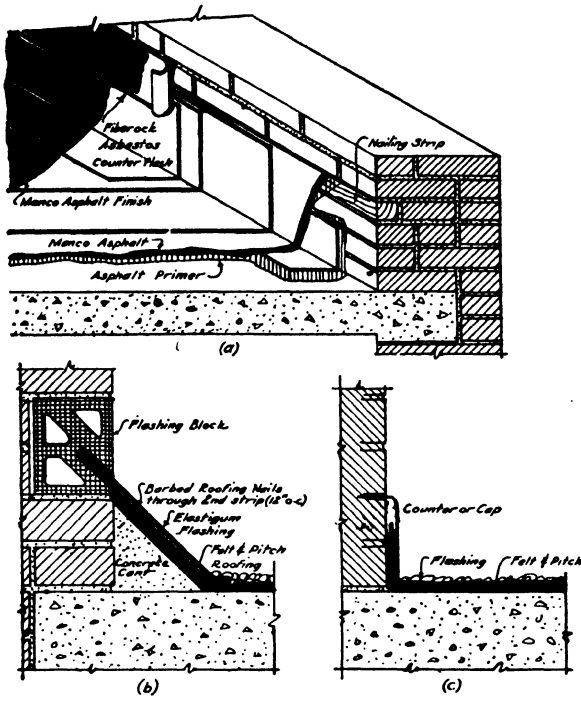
Flashing Parapets. (a) felt with wood nailer; (b) concrete cant; (c) standard cap.
